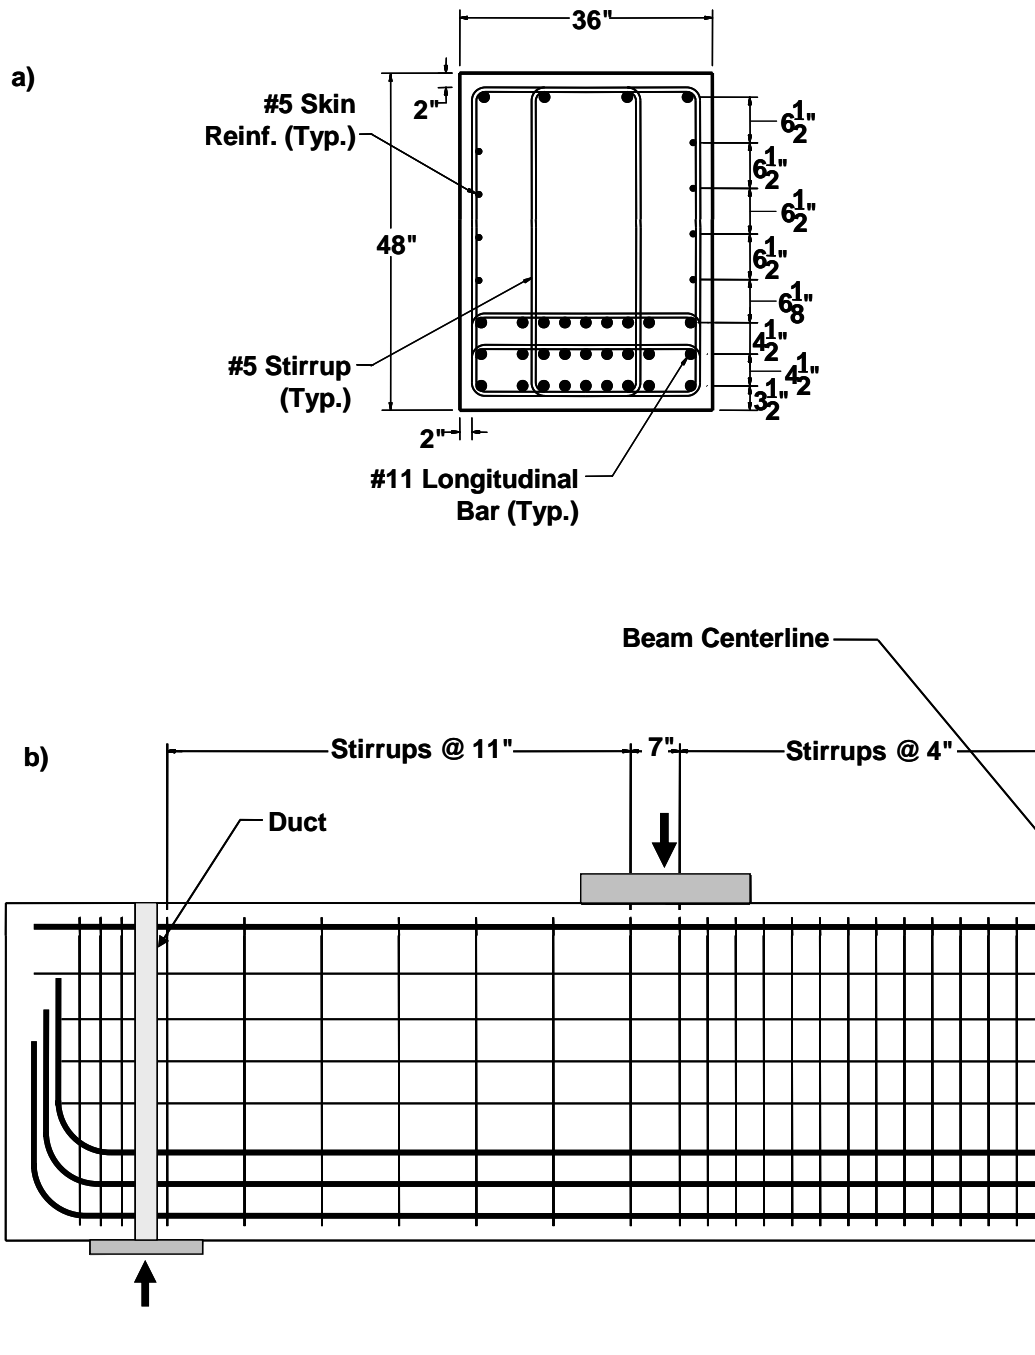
Shear span 1A a) Cross-section; b) Elevation
